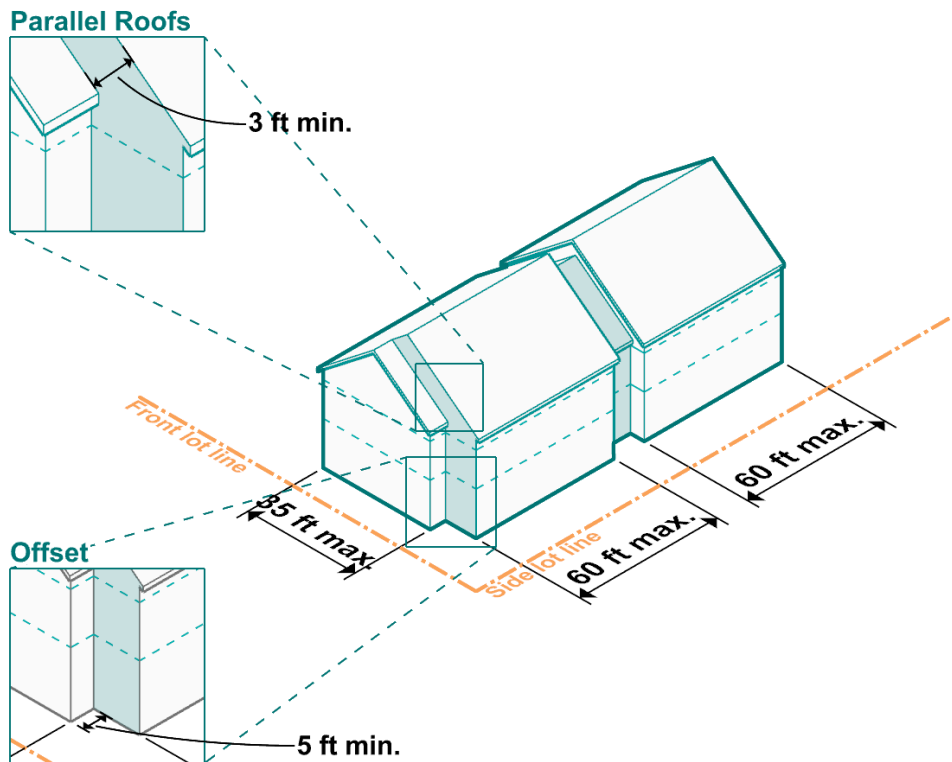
Facade Articulation Example for a Building with Parallel Roofs
